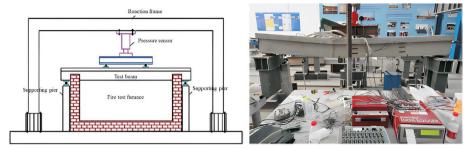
The fire model test (left) and static load test (right) of simply supported box girder with intumescent fire retardant coating
